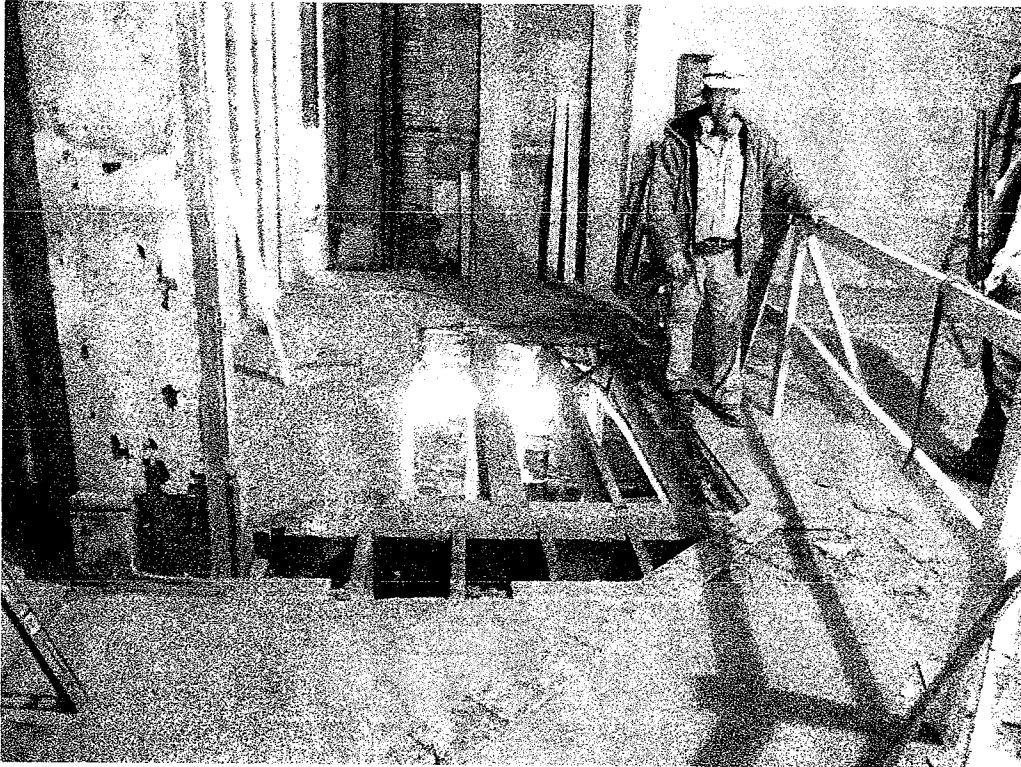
Work progressing for construction of main entrance at grid A/5.5.
